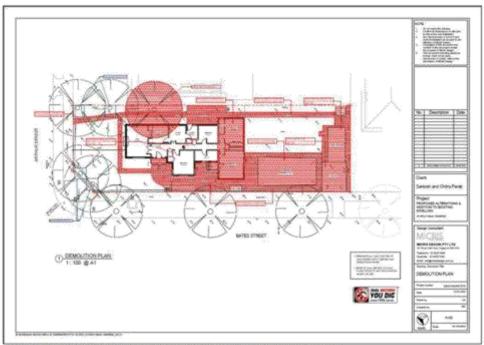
Proposed demolition plan (received by Heritage 21 on 11 September 2020).
